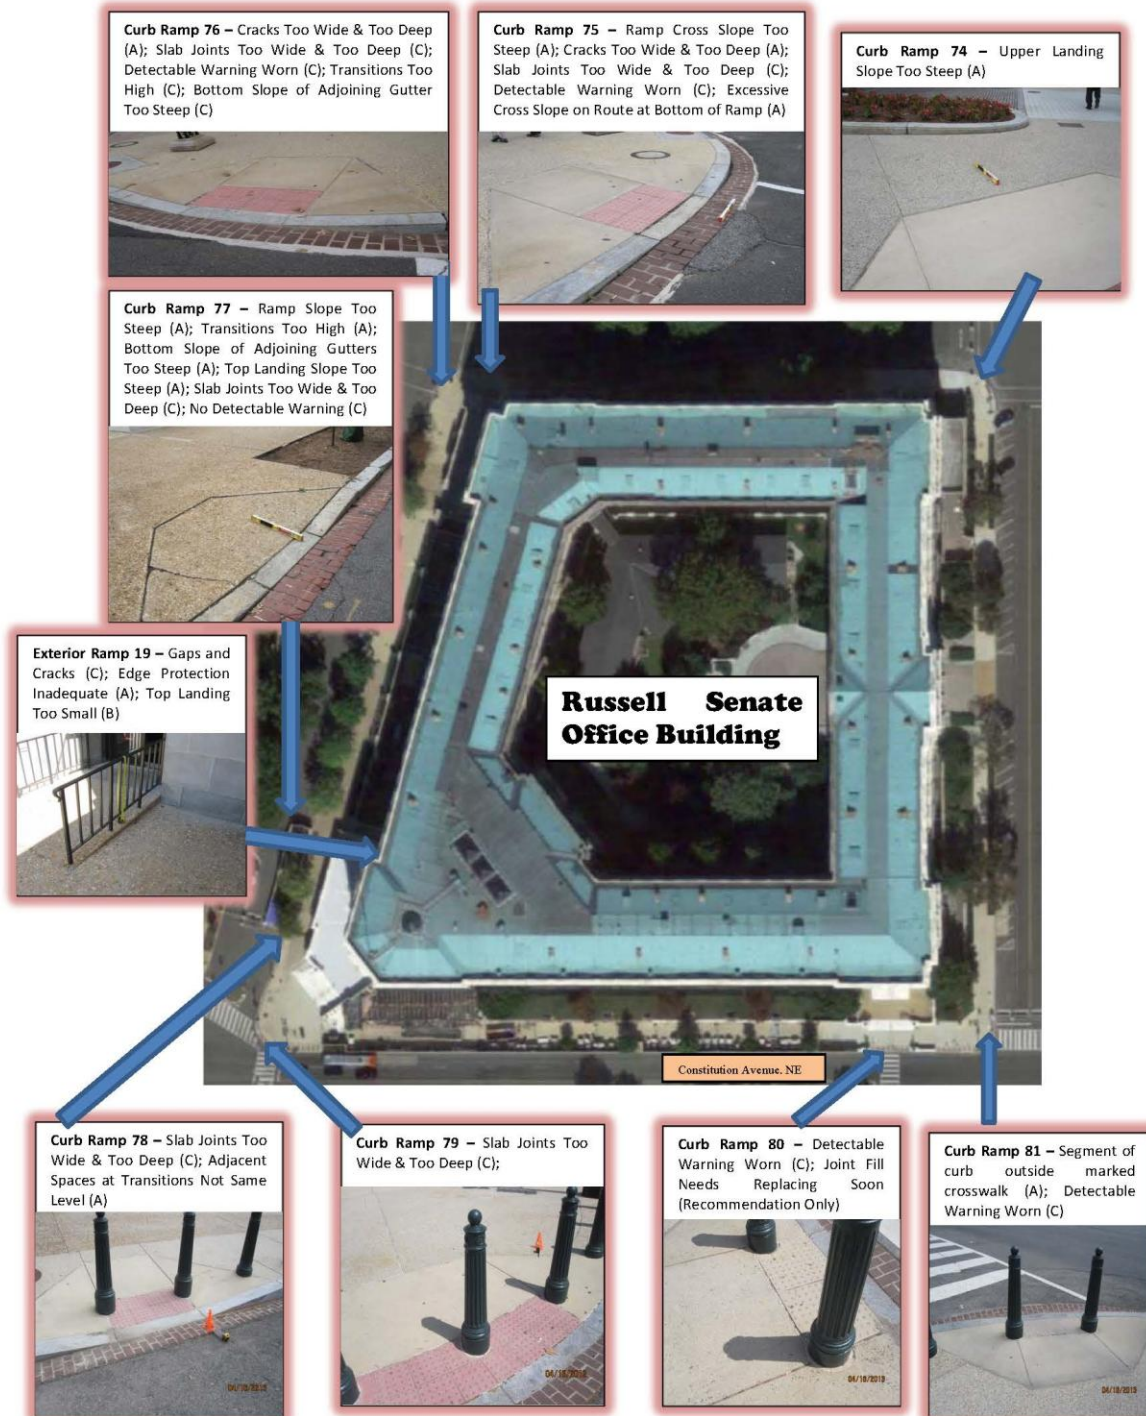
Curb Ramp & Exterior Ramp Barriers Surrounding Russell Senate Office Building.
